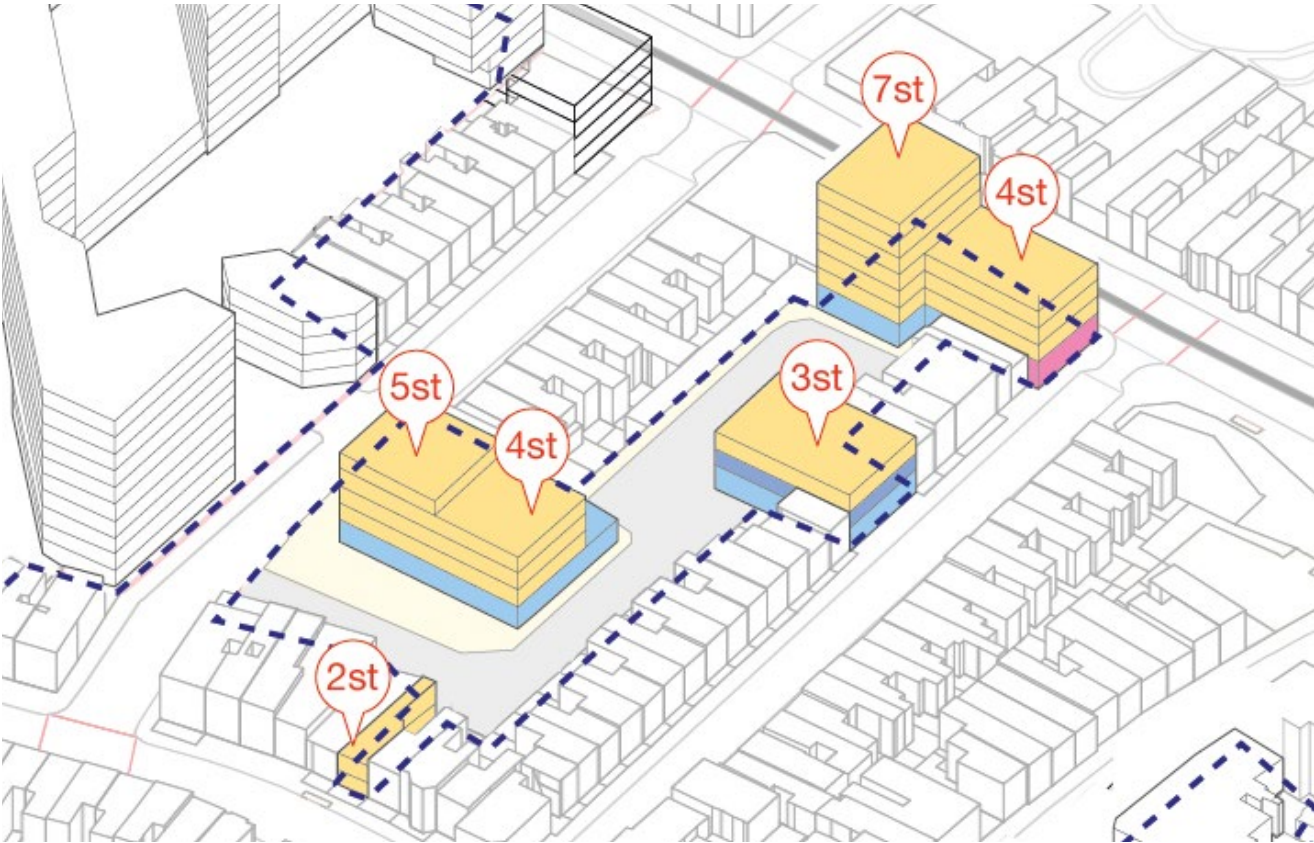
Proposed Massing BSSA8 indicating 2-7 storeys (6m-21m) (Hawkins\Brown Masterplan Report)
